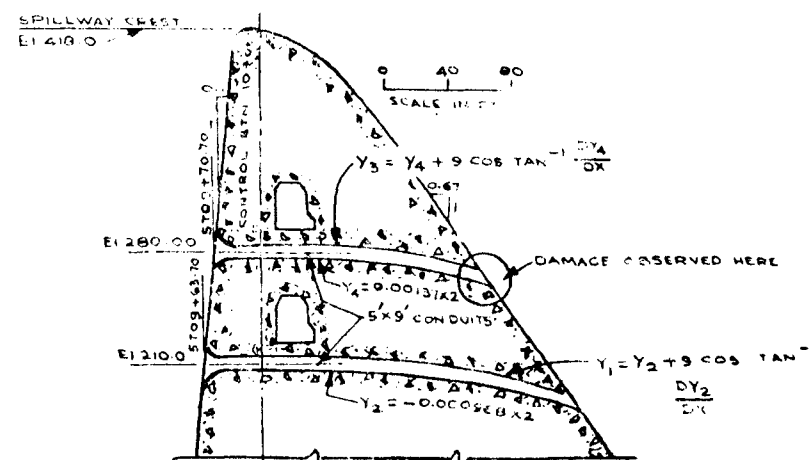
DETAILS OF FOLSOM DAM CONDUIT.
